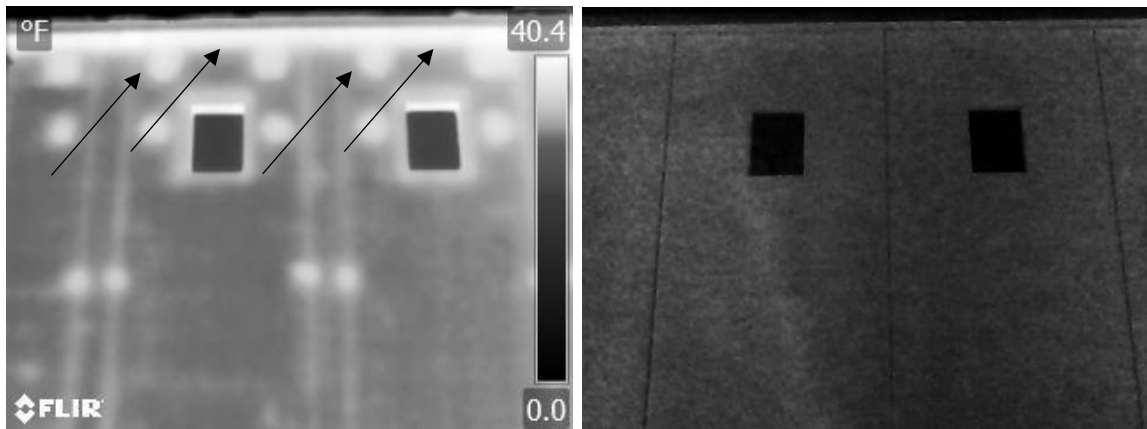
SWP structure with thermal bridging at roof and joist embedment: thermal image (left) and visual image (right)
